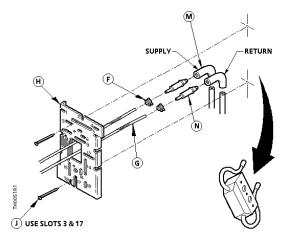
Honeywell TP 970-974 Shallow Wall Box with Plaster Ring.
